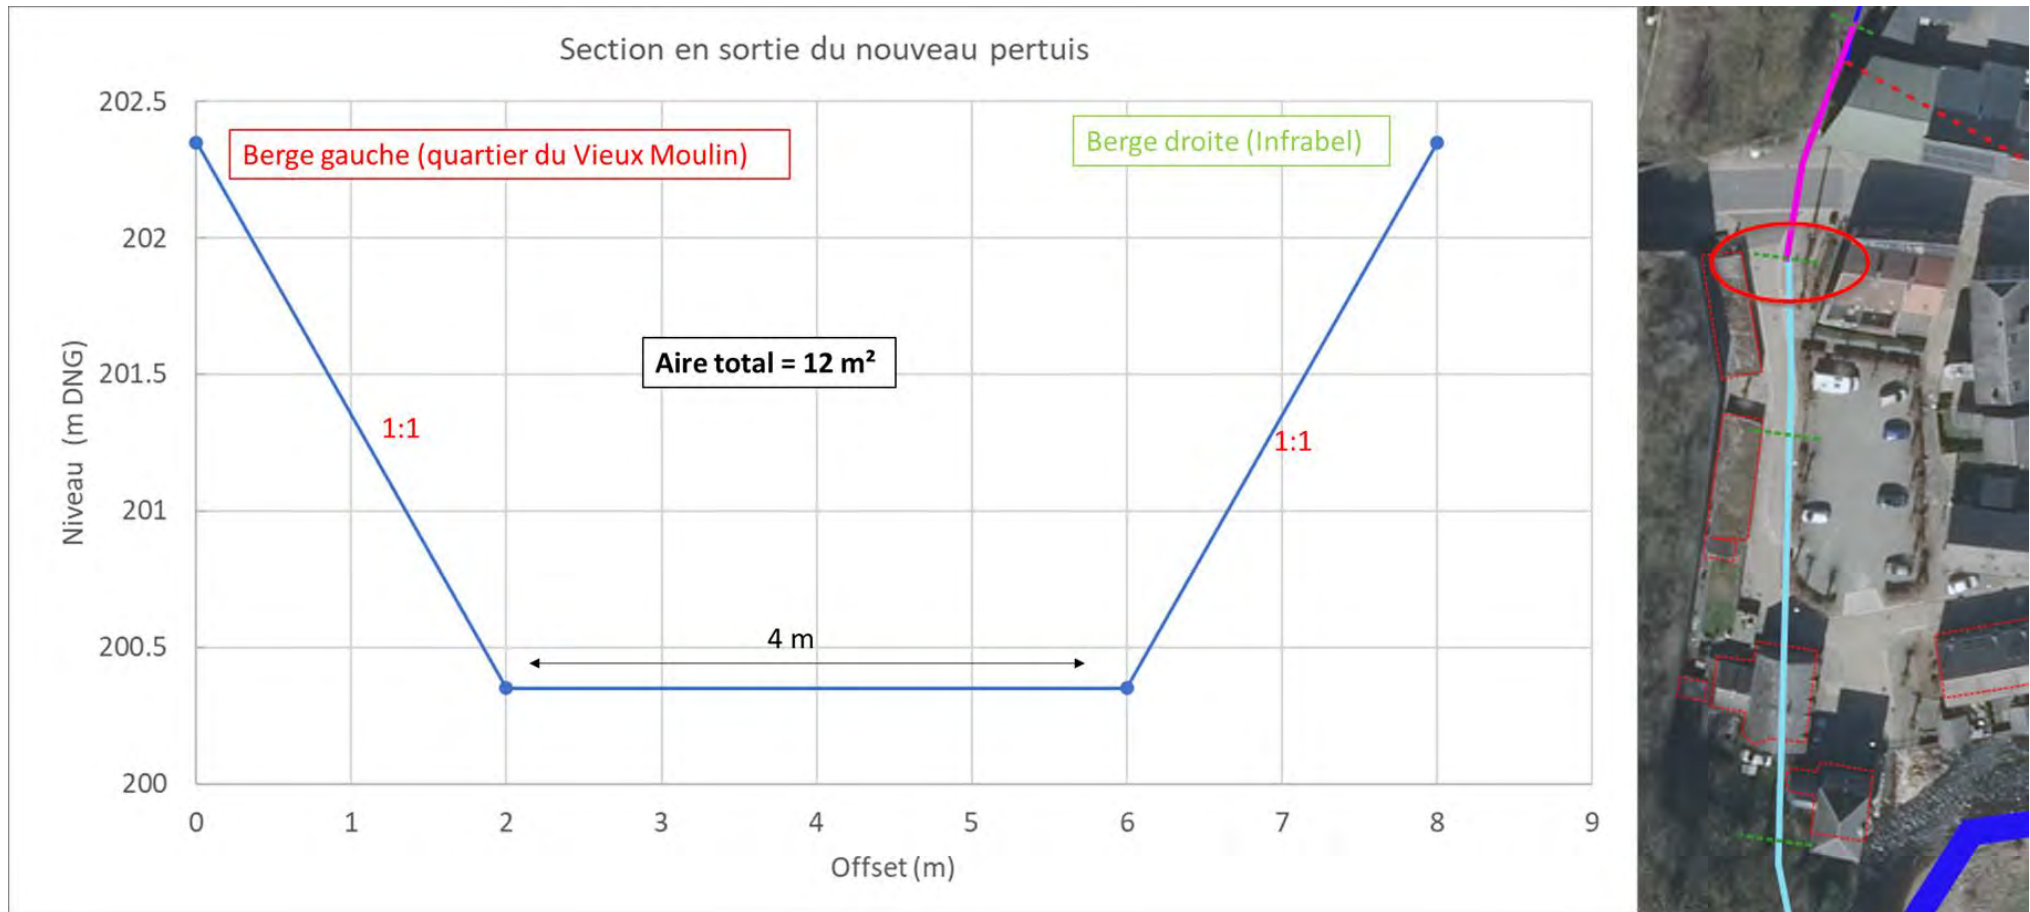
Proposed cross-section at the exit of the future tunnel passing under the Rue du Moulien en Ruyff.
